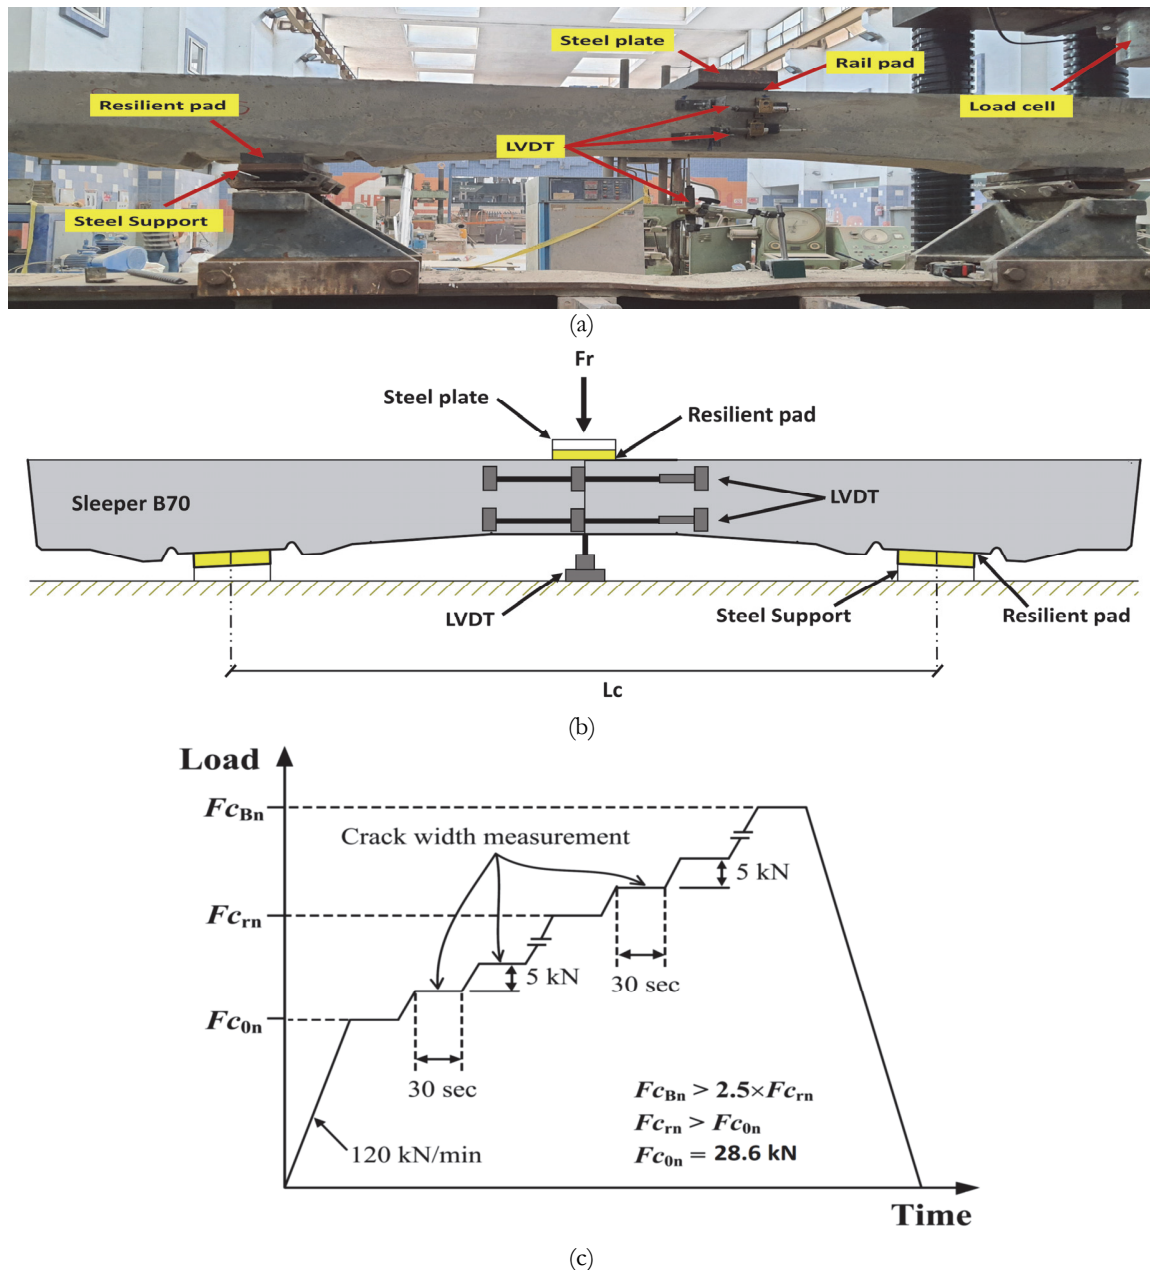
Static bending test at center section: (a) test setup; (b) test setup sketch; (c) loading protocol [30,31].
